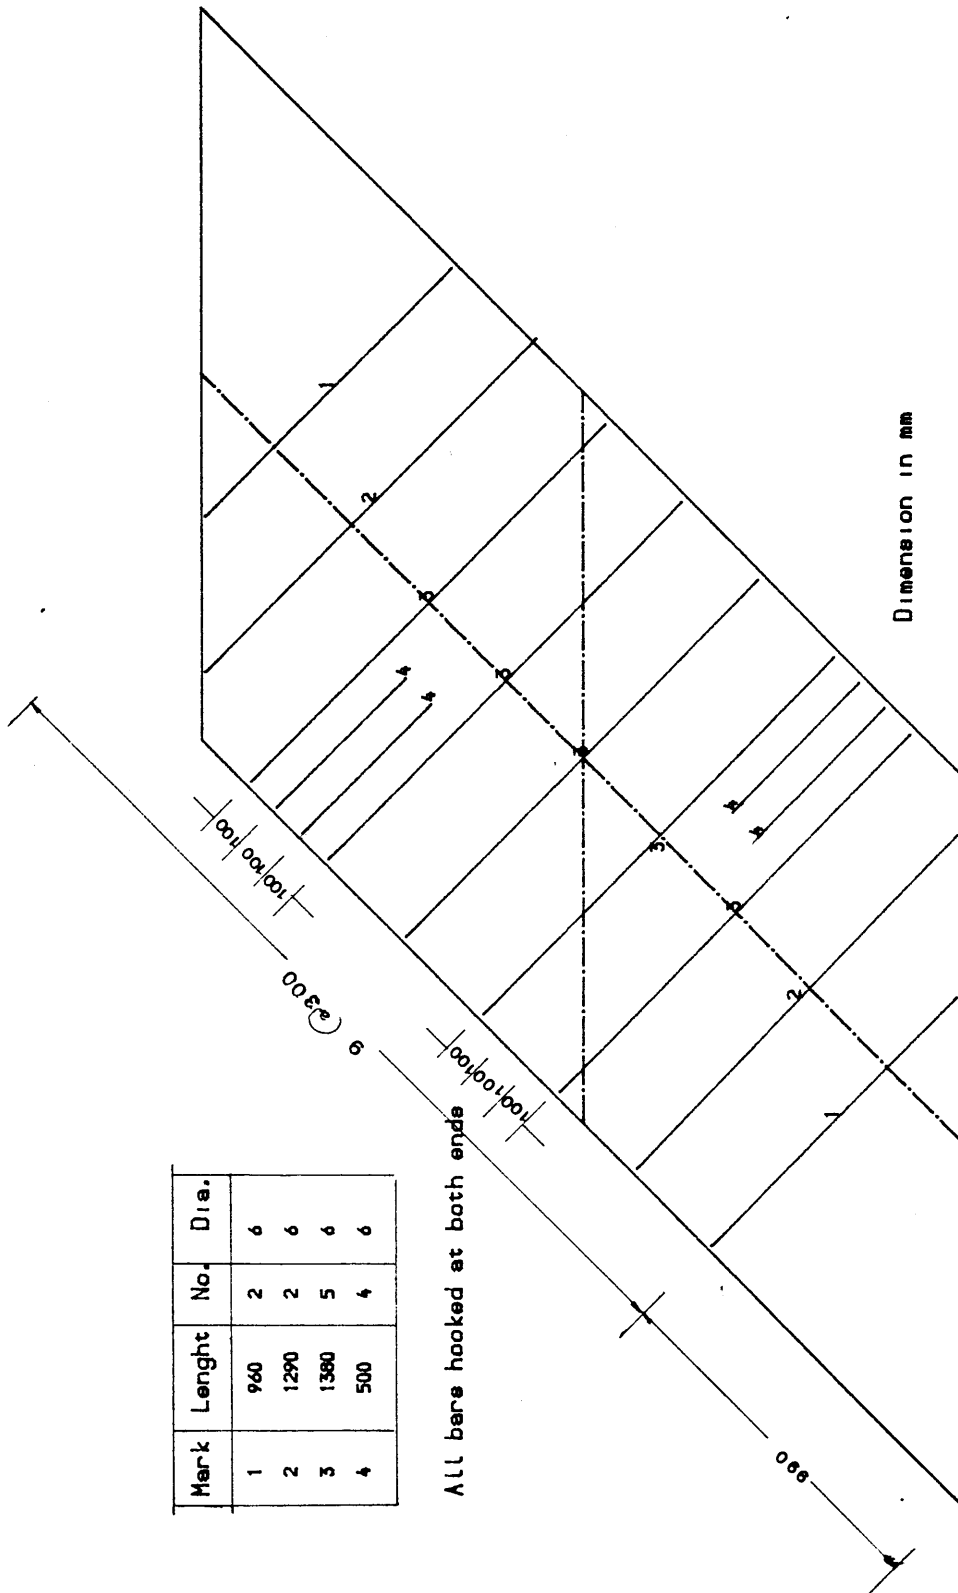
MODEL SKEW SLAB NO. (5) Details of top transverse steel orthogonal to the free edge.
